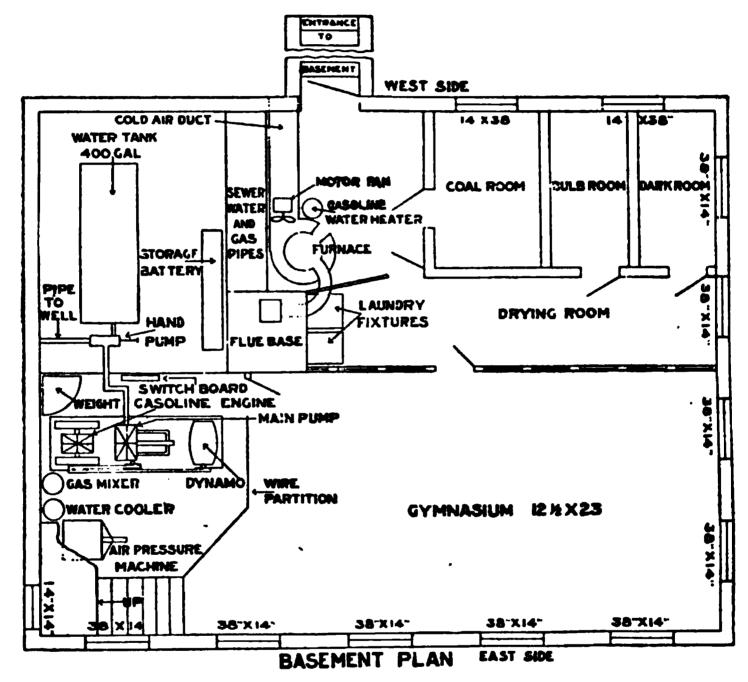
Basement plan, model rural school, Kirksville, Mo.
